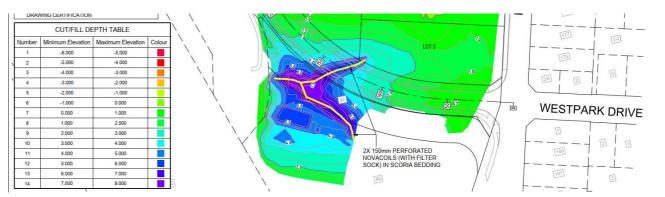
Cut/Fill as-built plan from Geotek Solutions GCR
